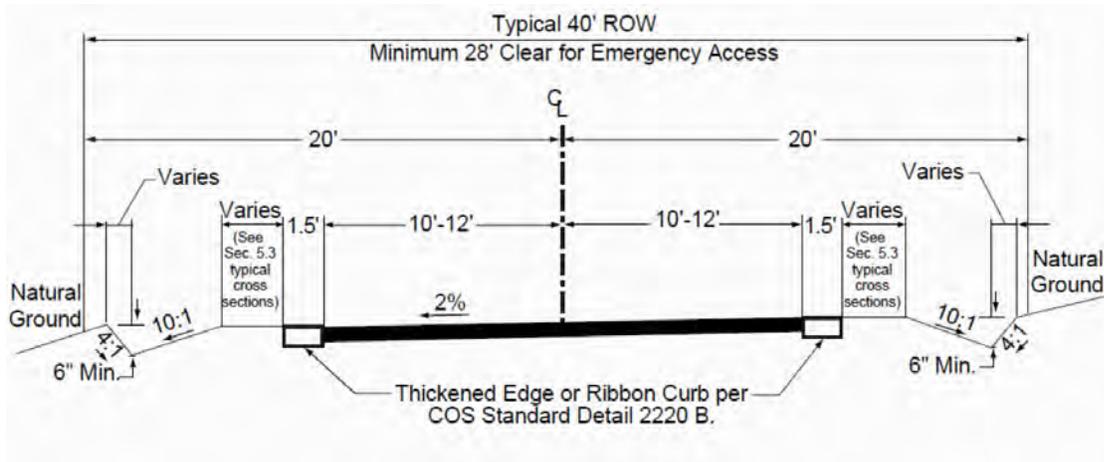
TYPICAL CROSS SECTION FOR ROADSIDE SWALES
